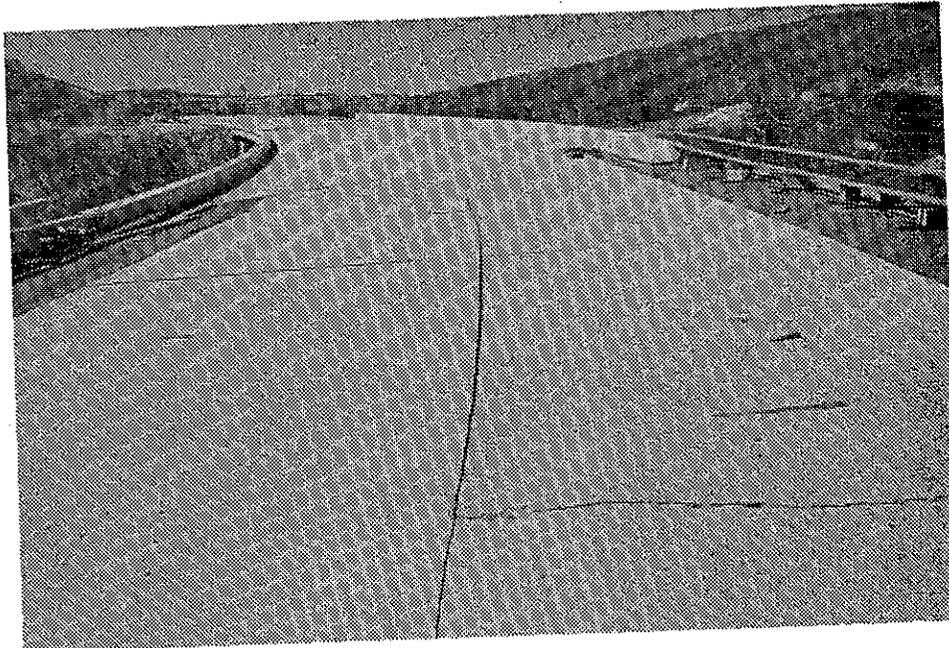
Pavement cracks and movement at the easterly approach to Bridge 53-1988L on the A-Y Connector, Route 5/210 Interchange.
